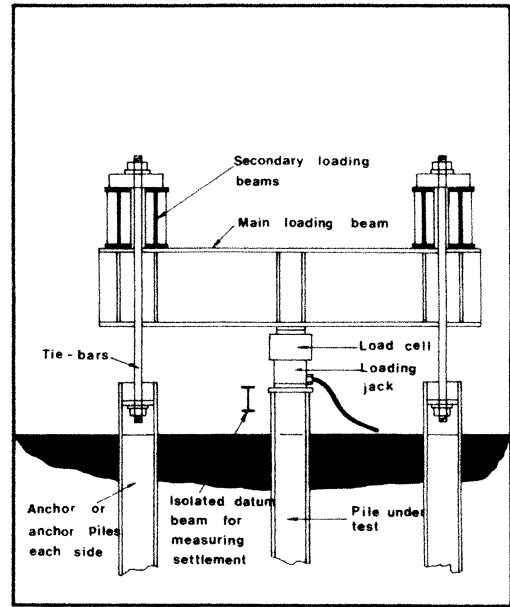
Test loading – typical arrangement using anchors (Cornfield, 1974)
